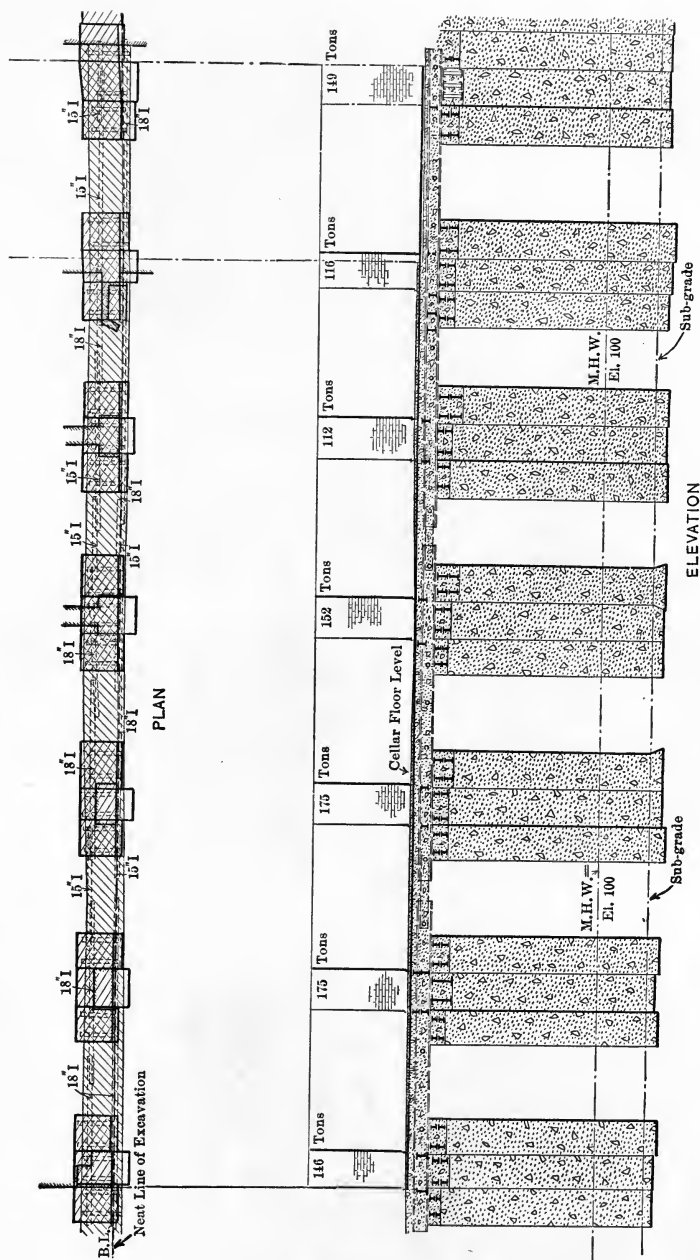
Showing Concrete-Steel Grillage, Underpinning Piers, and Wedging Beams to Convey Load of the Columns to the Piers. Typical for Moderate-Sized Buildings
